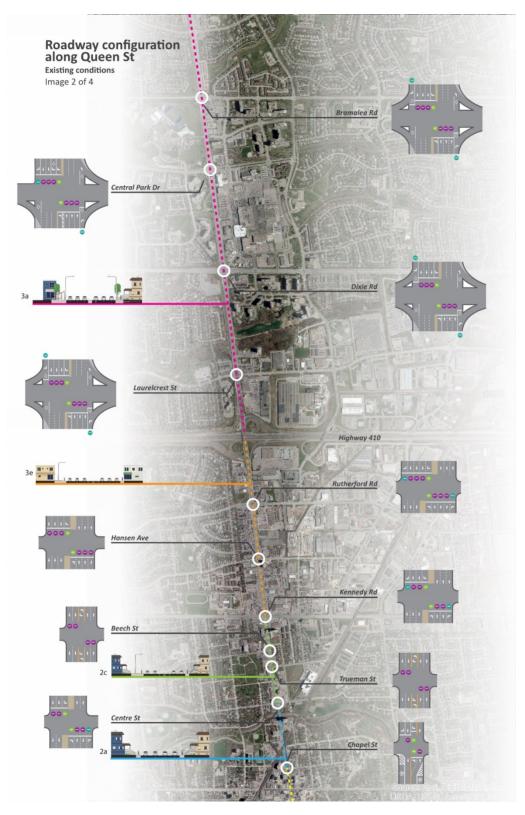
Roadway configuration along Queen Street, Chapel Street to Bramalea Road
